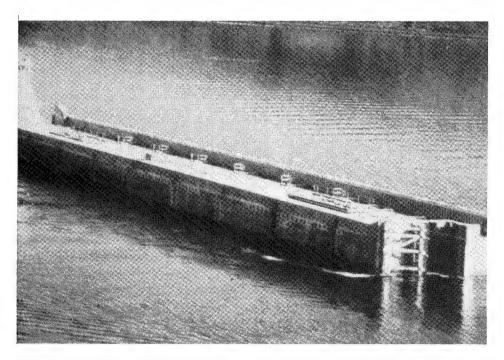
Precast concrete floating guidewall, Bonneville Lock (from Soast 1993)
